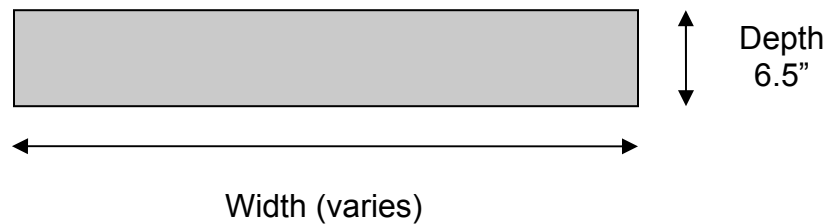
Deck Cantilever Truss Bridge Deck Section
